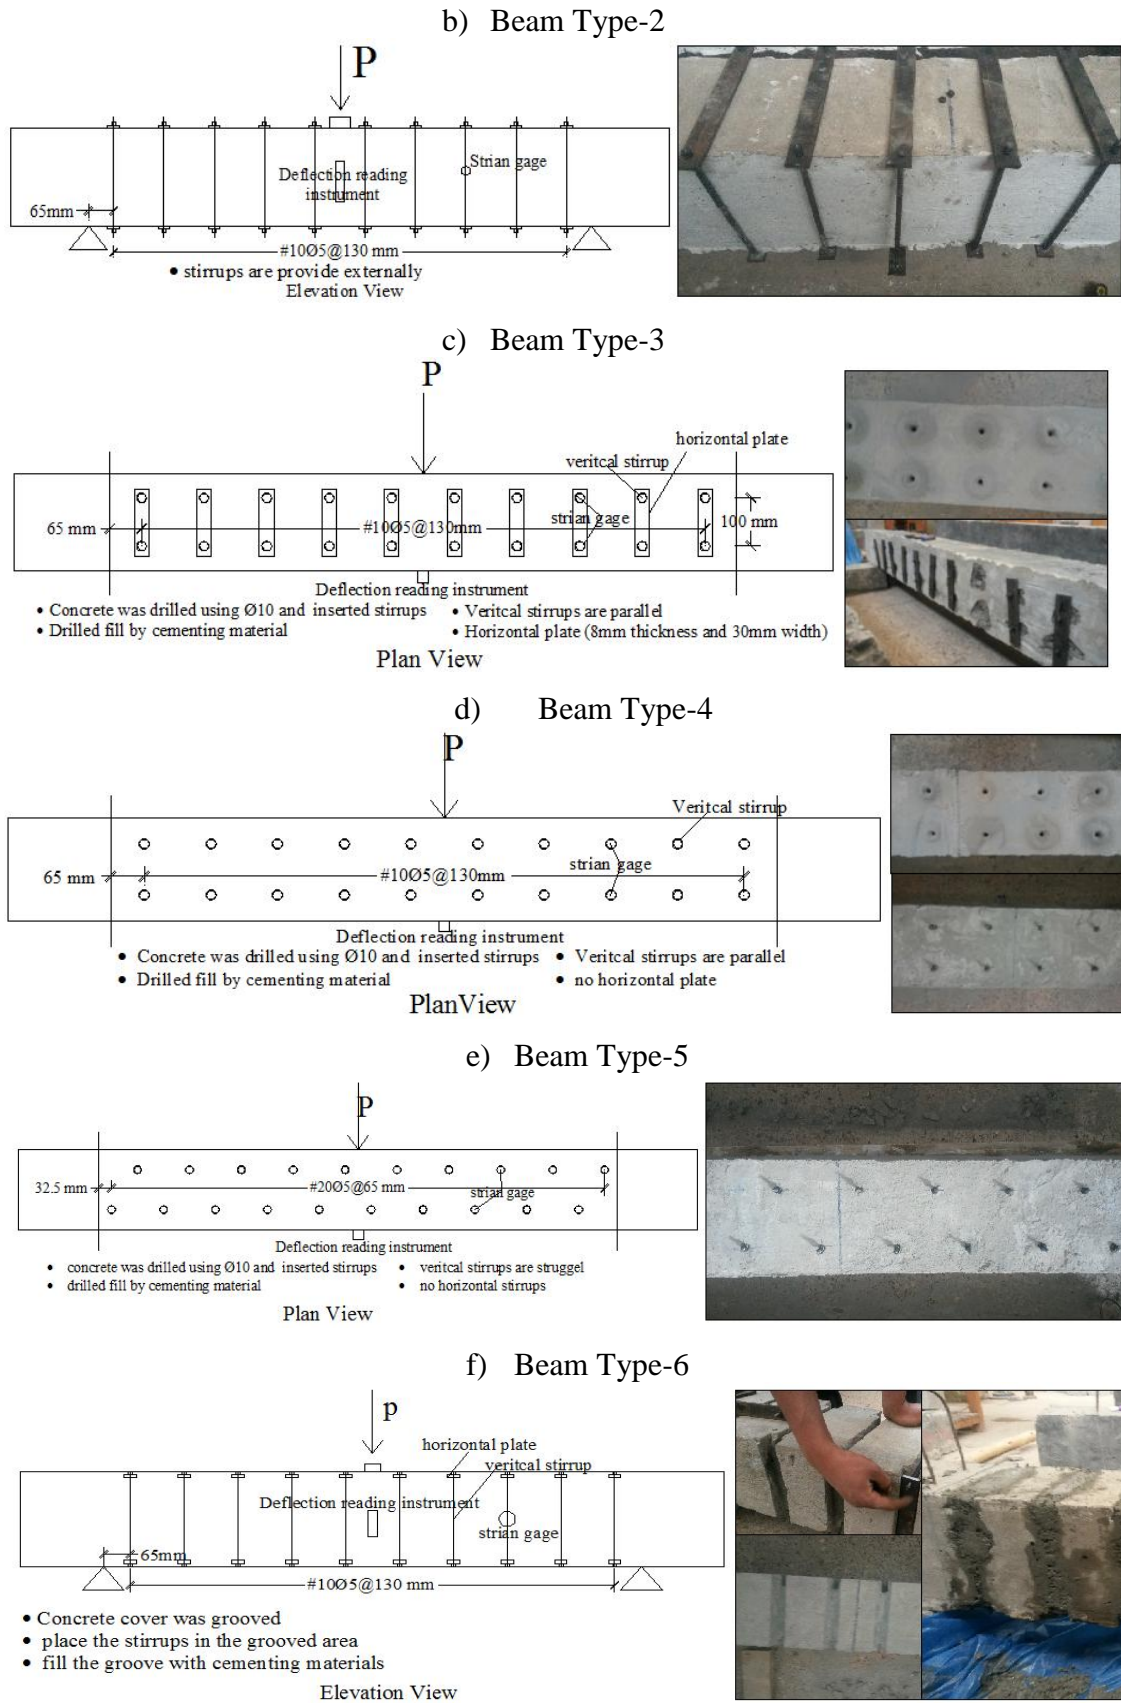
Beam Types and Configuration of Web Reinforcement
